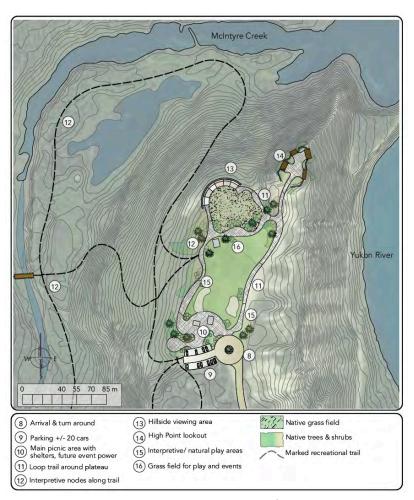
Point Park concept (Source: Jane of all Trades Consulting)
